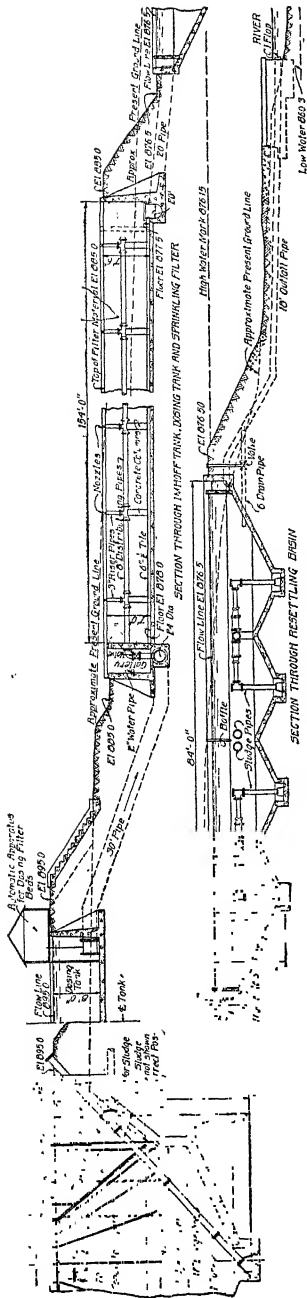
Section of Sewage Disposal Plant at Connellsville, Pennsylvania
